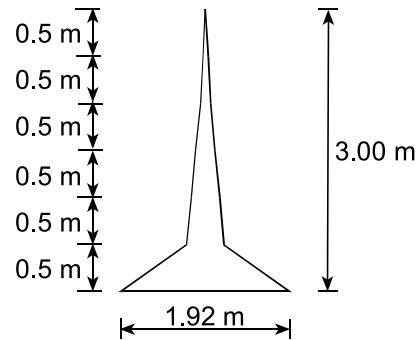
Optimum cross-section of a gravity retaining wall with a height of 3 m.
